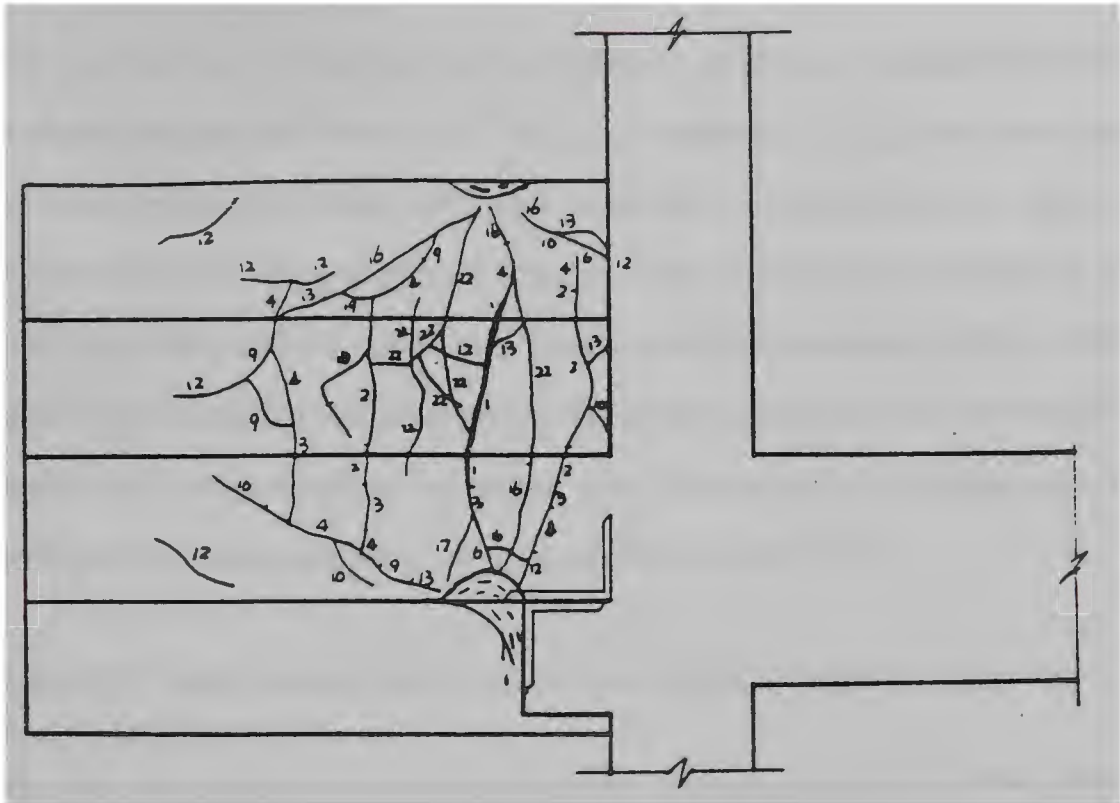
Crack Pattern for Specimen RPB2
